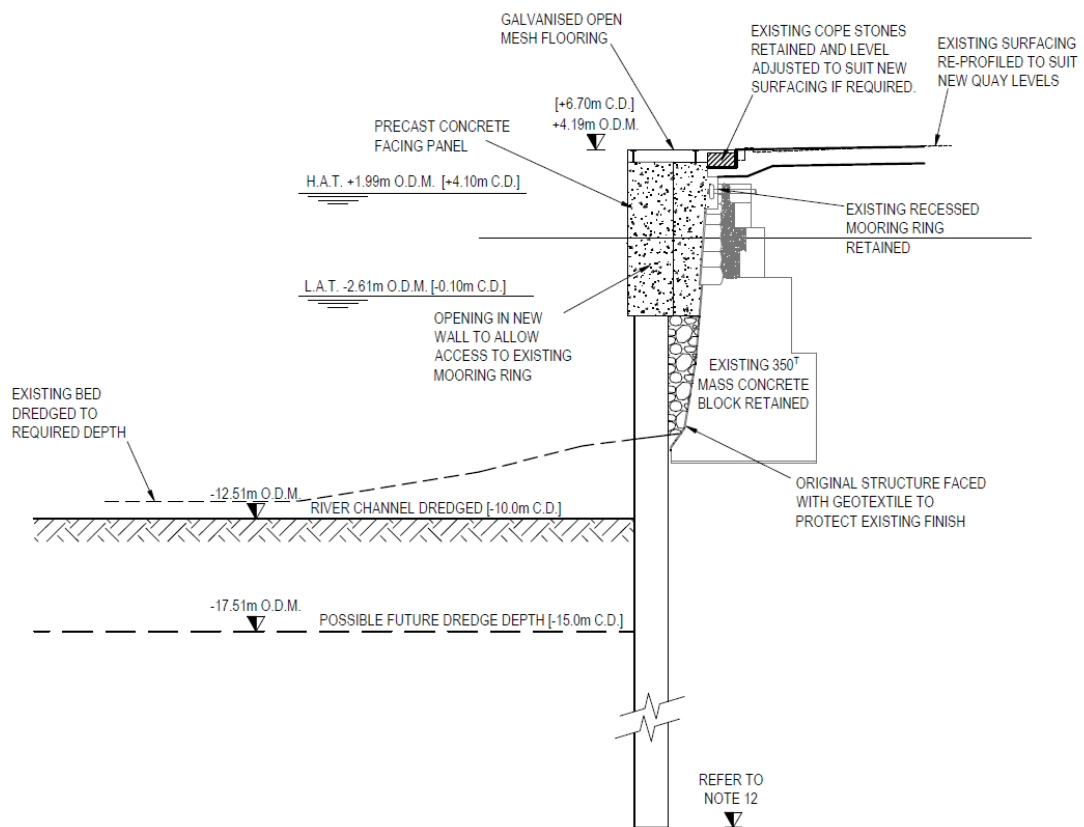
DESIGN OF THE NEW PILED WALL OUTSIDE THE ORIGINAL QUAY ON THE RIVER SIDE OF NORTH WALL QUAY EXTENSION
